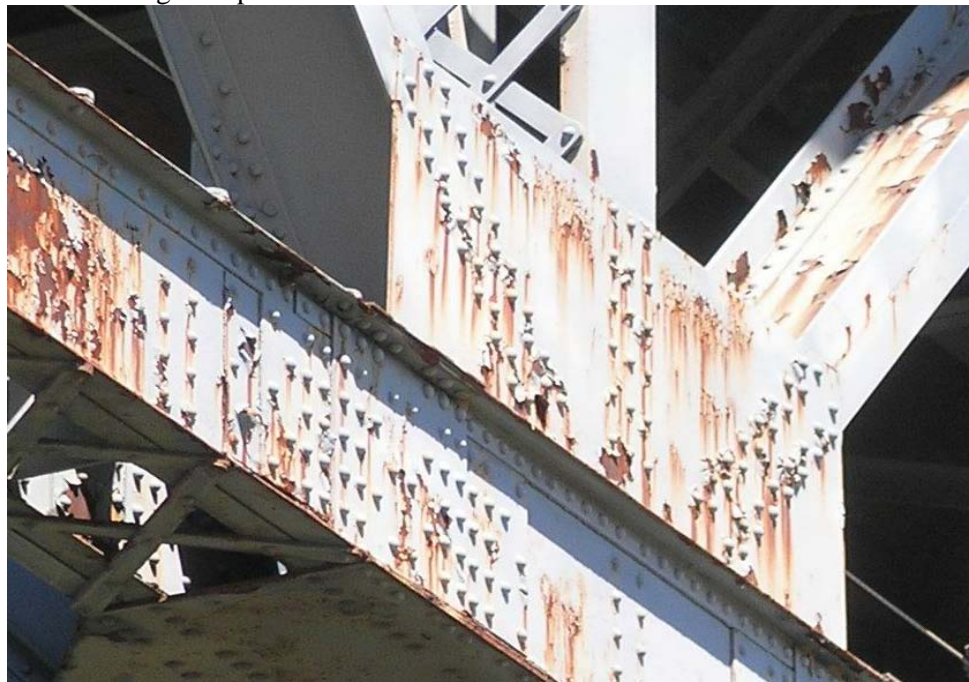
Gusset Plate Connection with Coating System Failure
